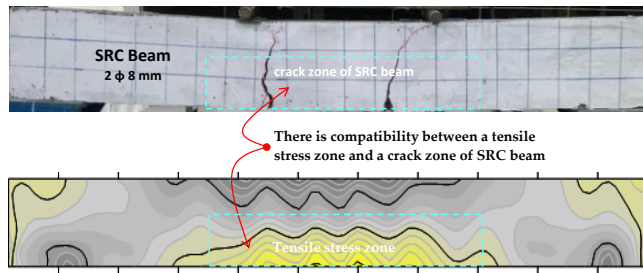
The crack pattern and tensile stress zone of SRC beam.
